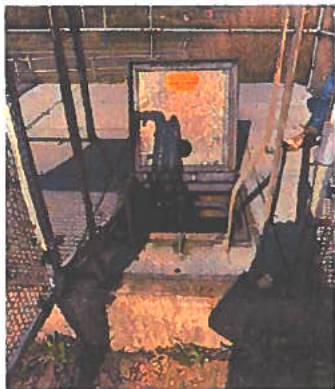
Crumbles Outfall – Inner chamber (Royal Parade) hatch.
